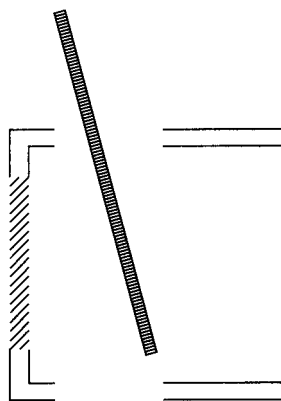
When inserting the threaded rod through the unit knockouts, angle it through the top, careful not to damage unit coil or insulation.
